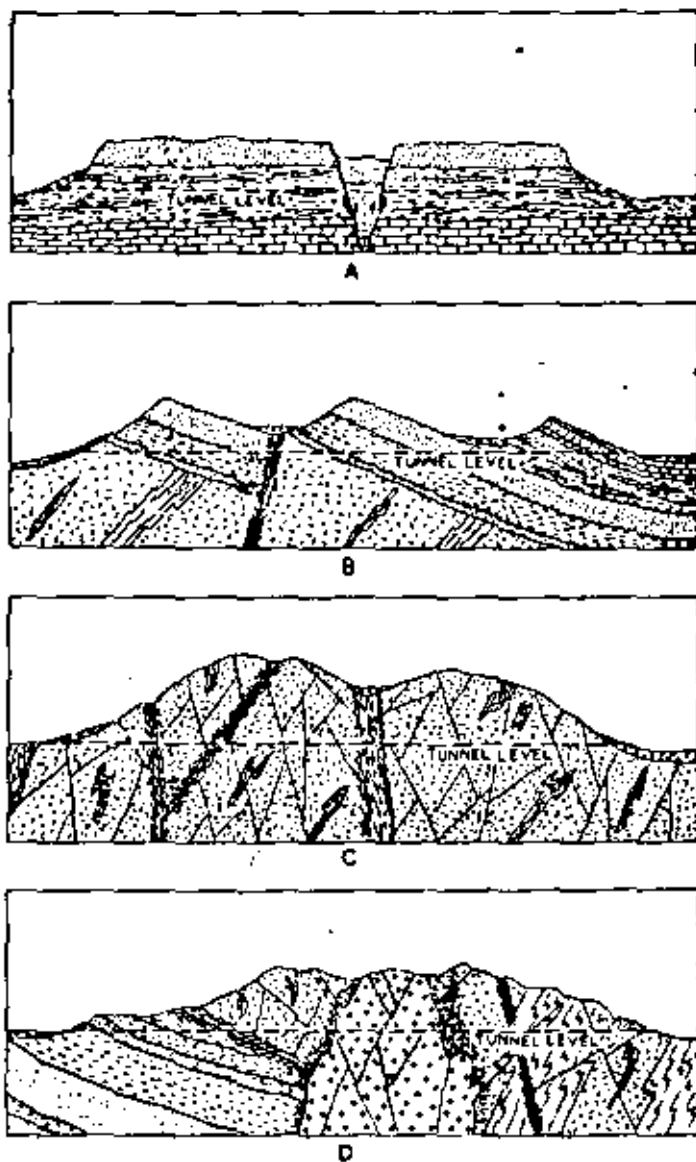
Hypothetical longitudinal cross-sections along alignments of proposed tunnels. See text discussion.
